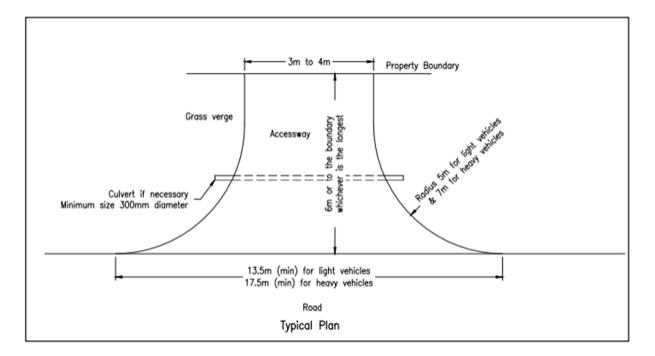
Indicative Symonds Construction Yard Site Entrance(HDC Development Engineering Standard R18)
